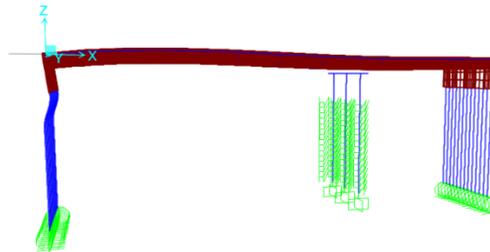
Deformed shape of the bridge and pile foundations under lateral spreading (exaggerated)
